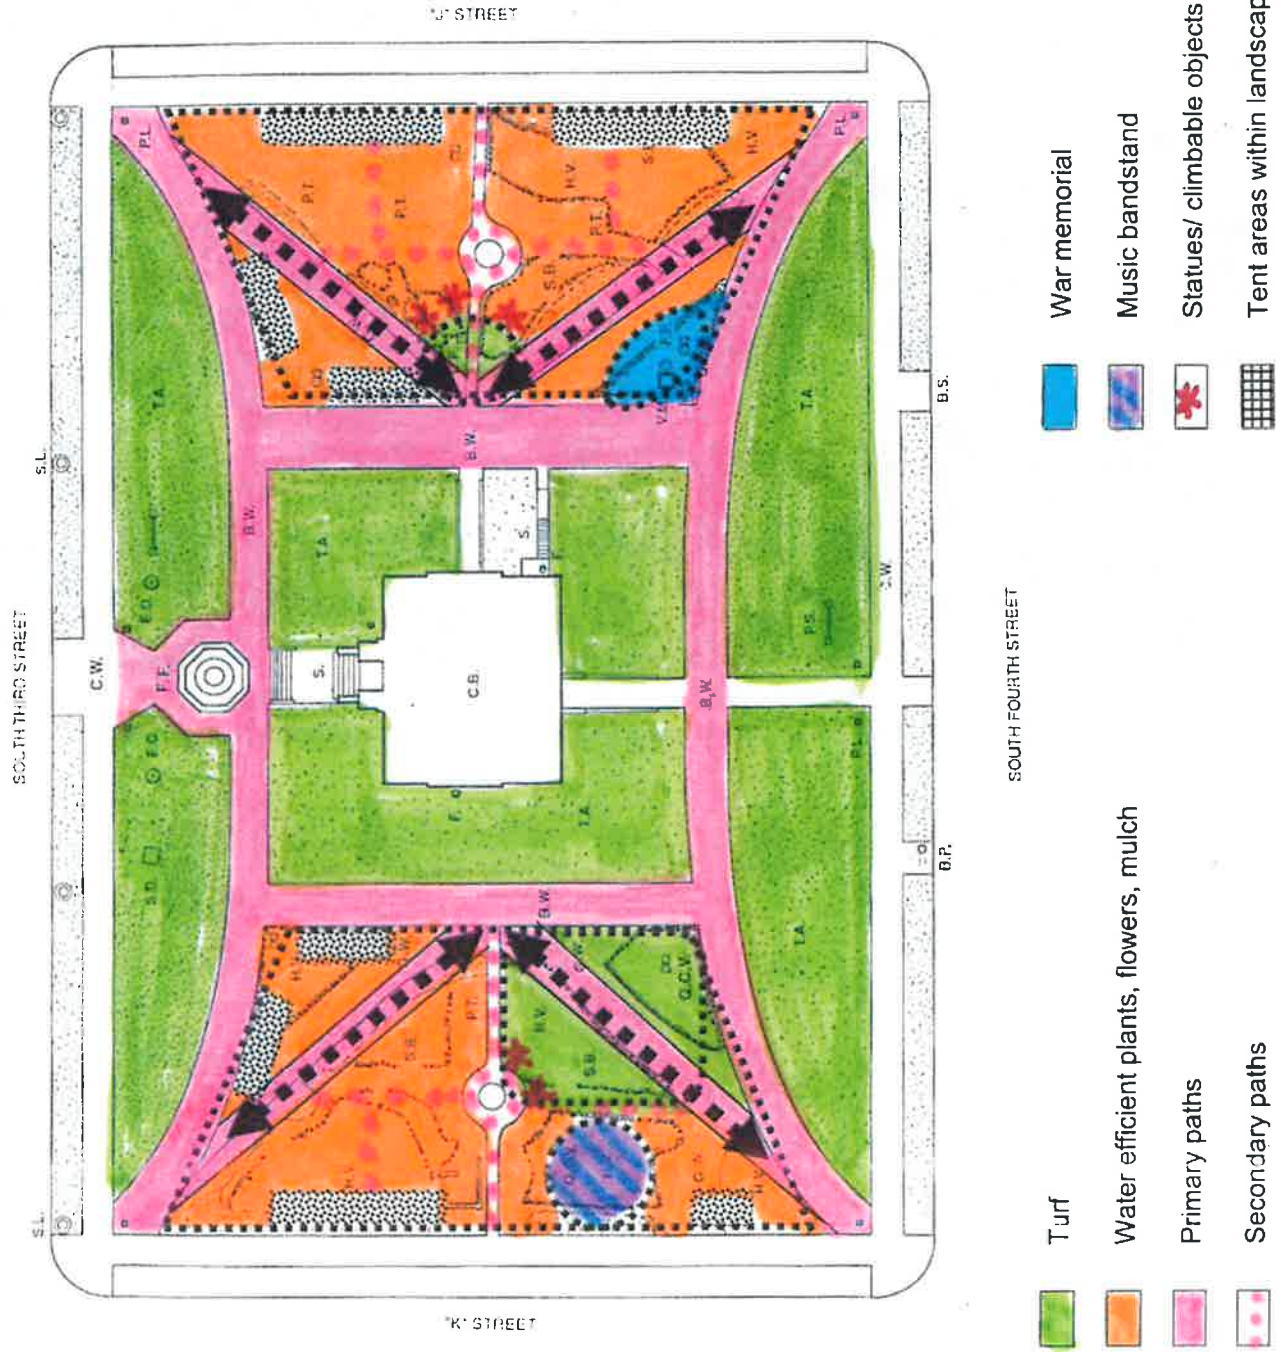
Above, an illustrative diagram in color showing the general locations of plan components within the area bounded by the public street sidewalks
